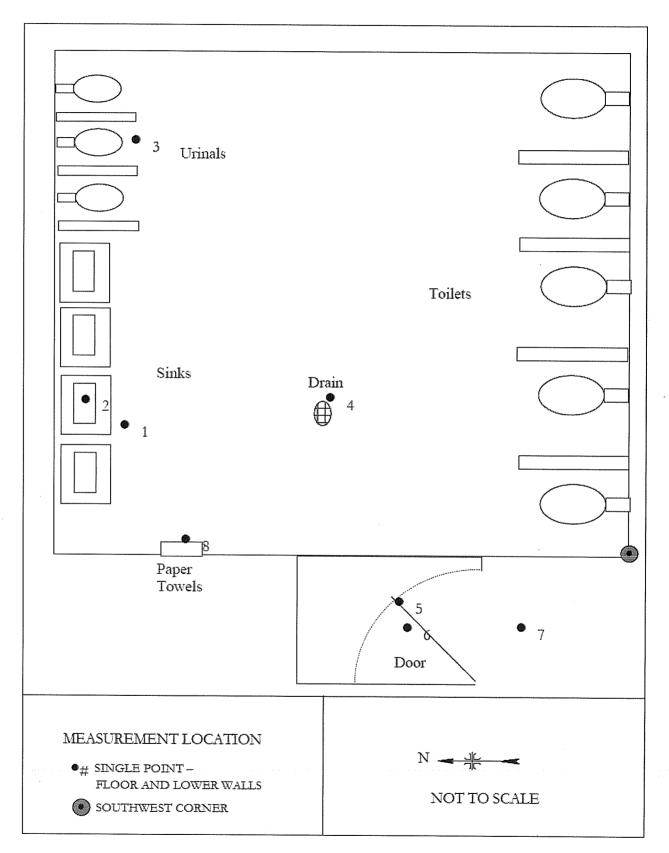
Men's Restroom, Floor and Lower Walls - Direct Measurement Locations
